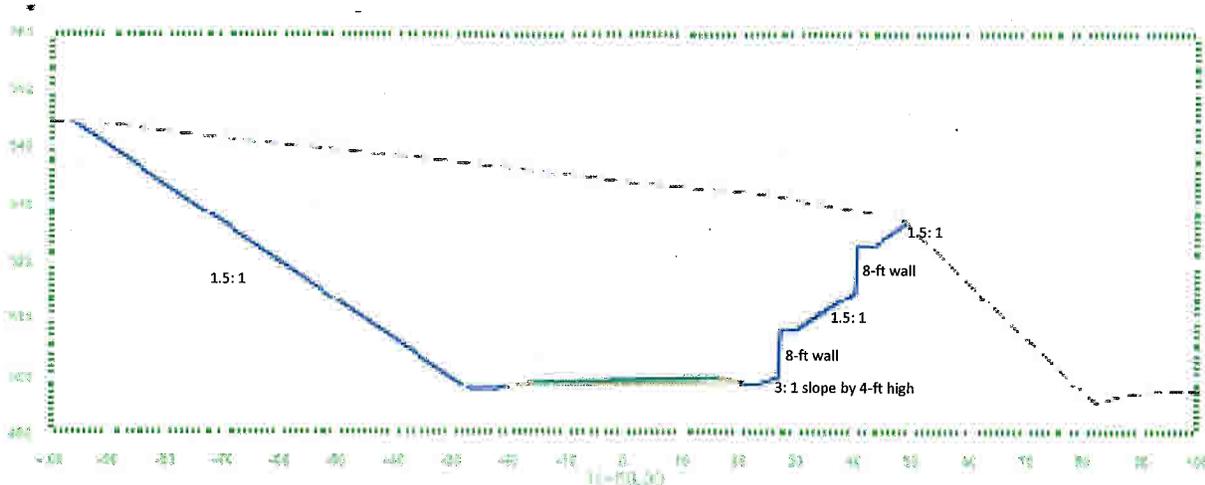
Cross section of Stepped wall Alternative 7c. Cross section is looking East.
